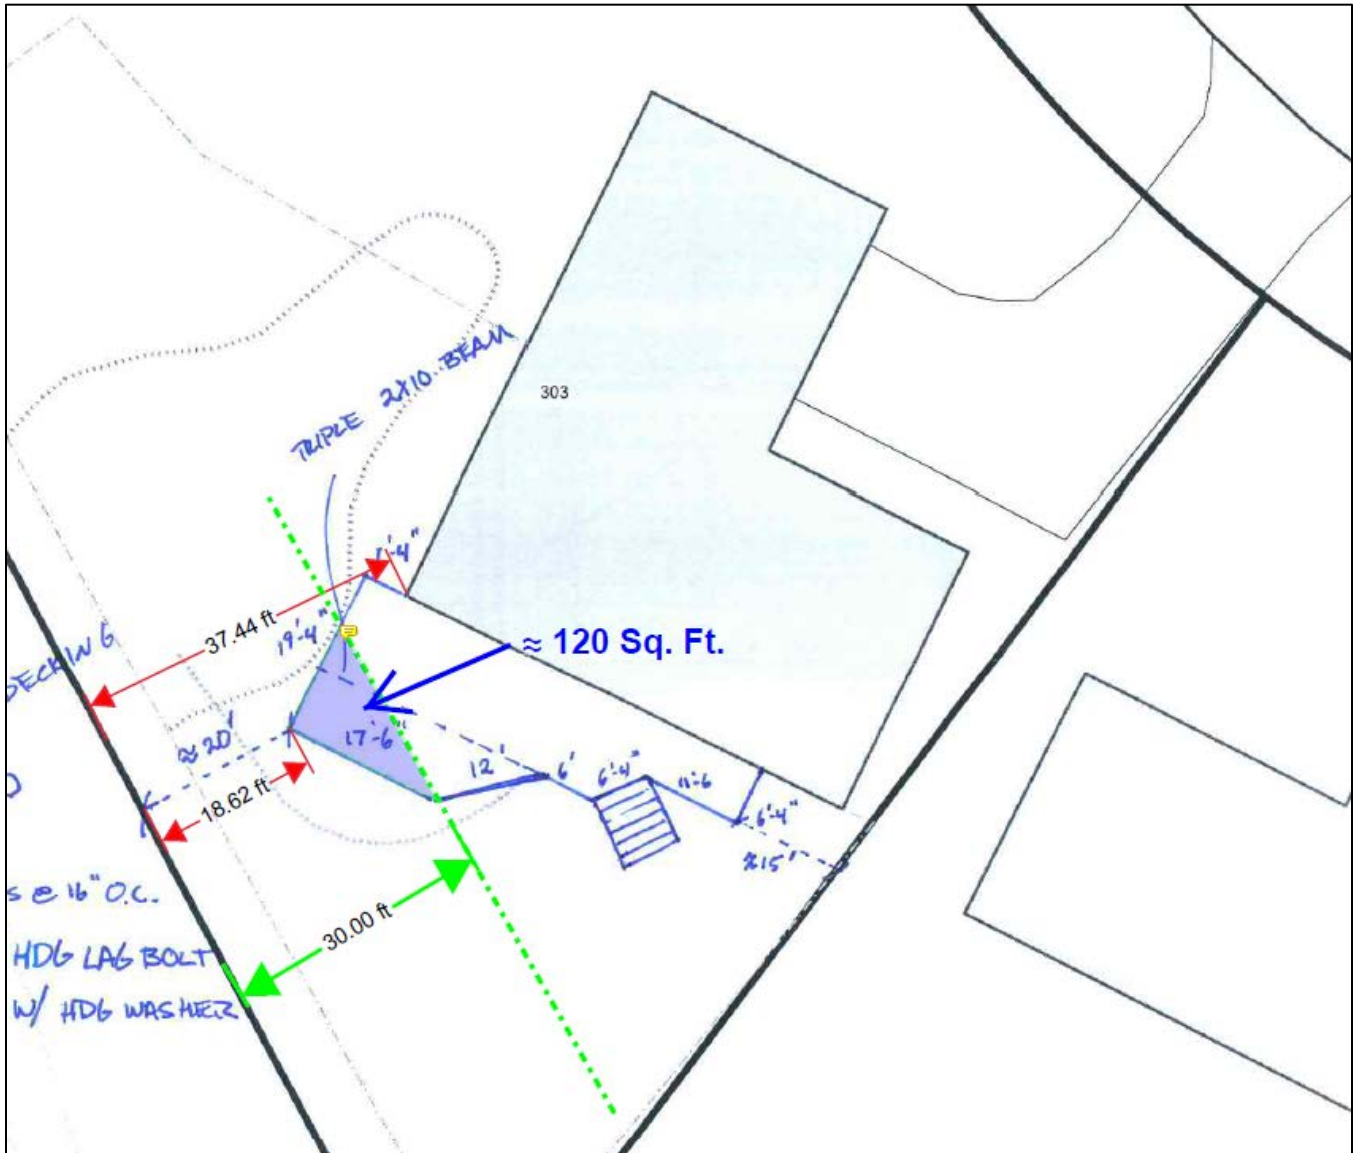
Staff Measurements Sketch of Submitted Plot Plan
